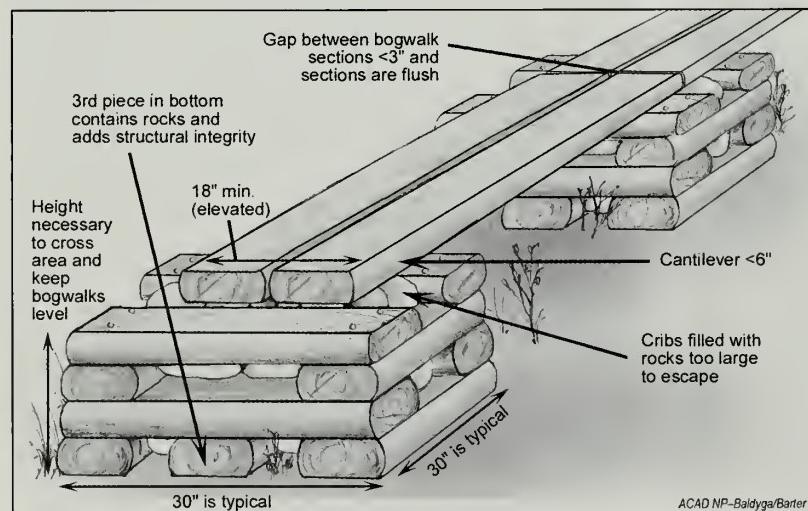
Detail of a bogwalk on log cribs (or piers).
